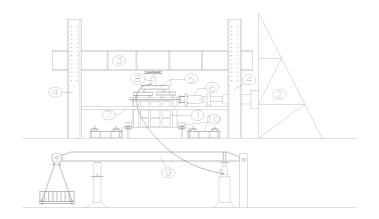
Experimental set-up: 1-Test specimen, 2-Reaction wall, 3-Steel beam,
